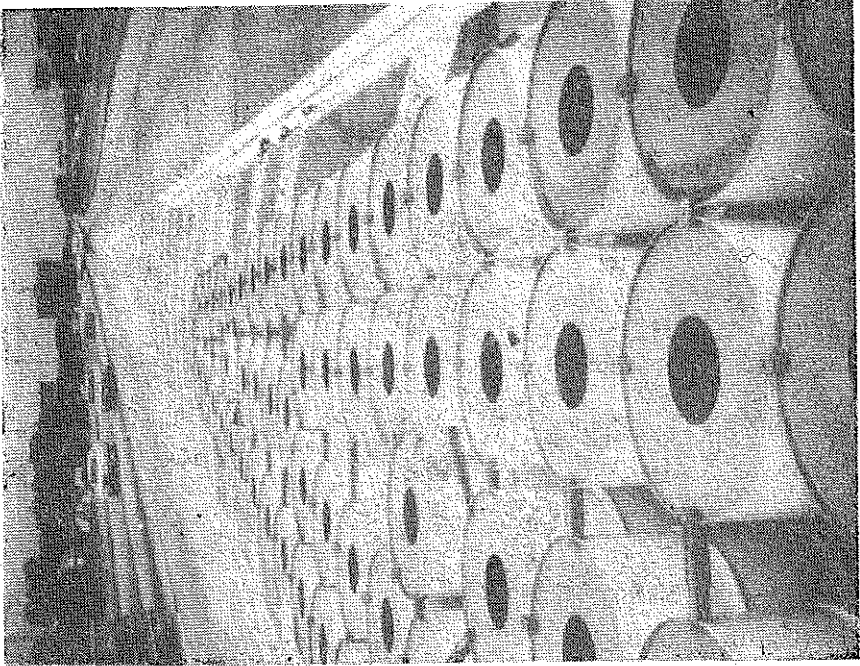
View from gore area towards road overlooking steel barrel barrier.
